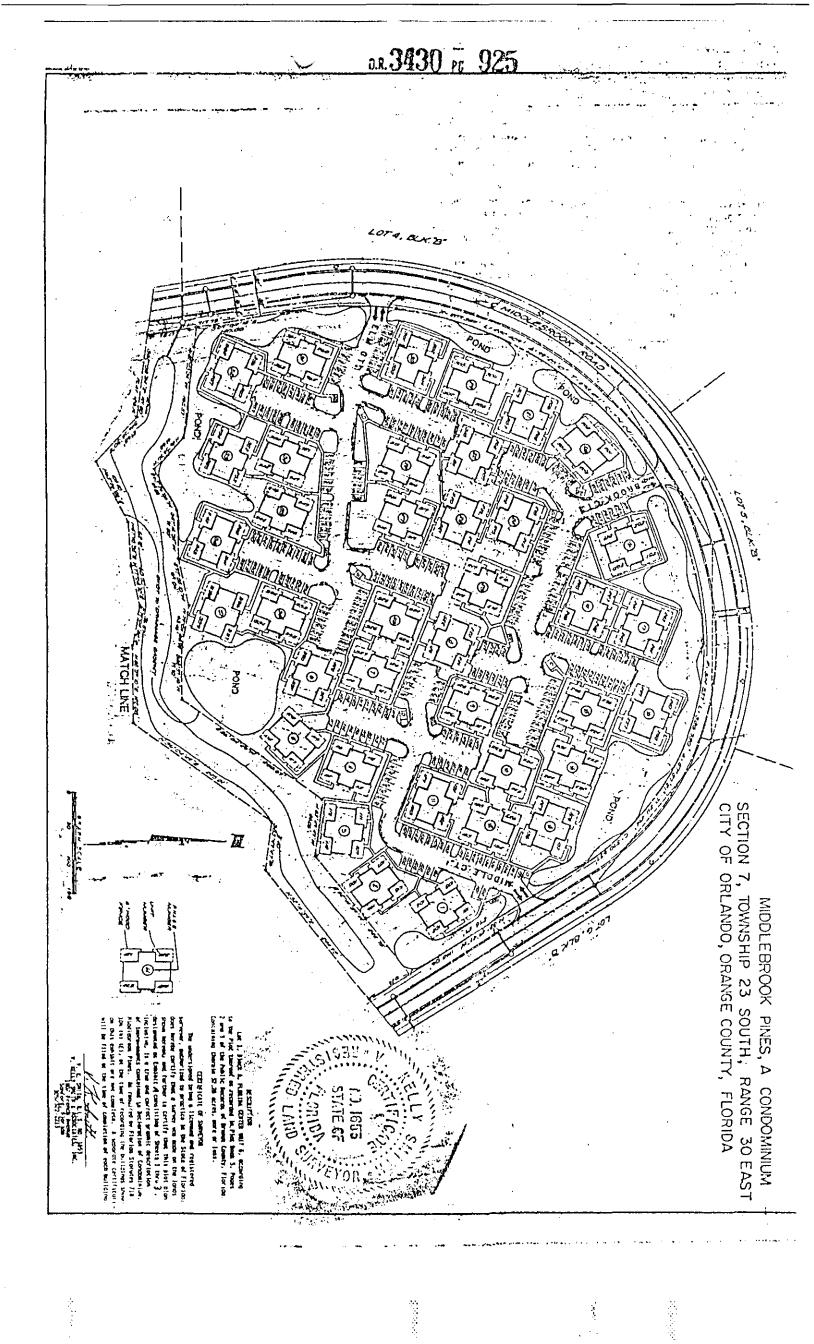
EXHIBIT A TO DECLARATION OF CONDOMINIUM SURVEY AND SITE PLAN
